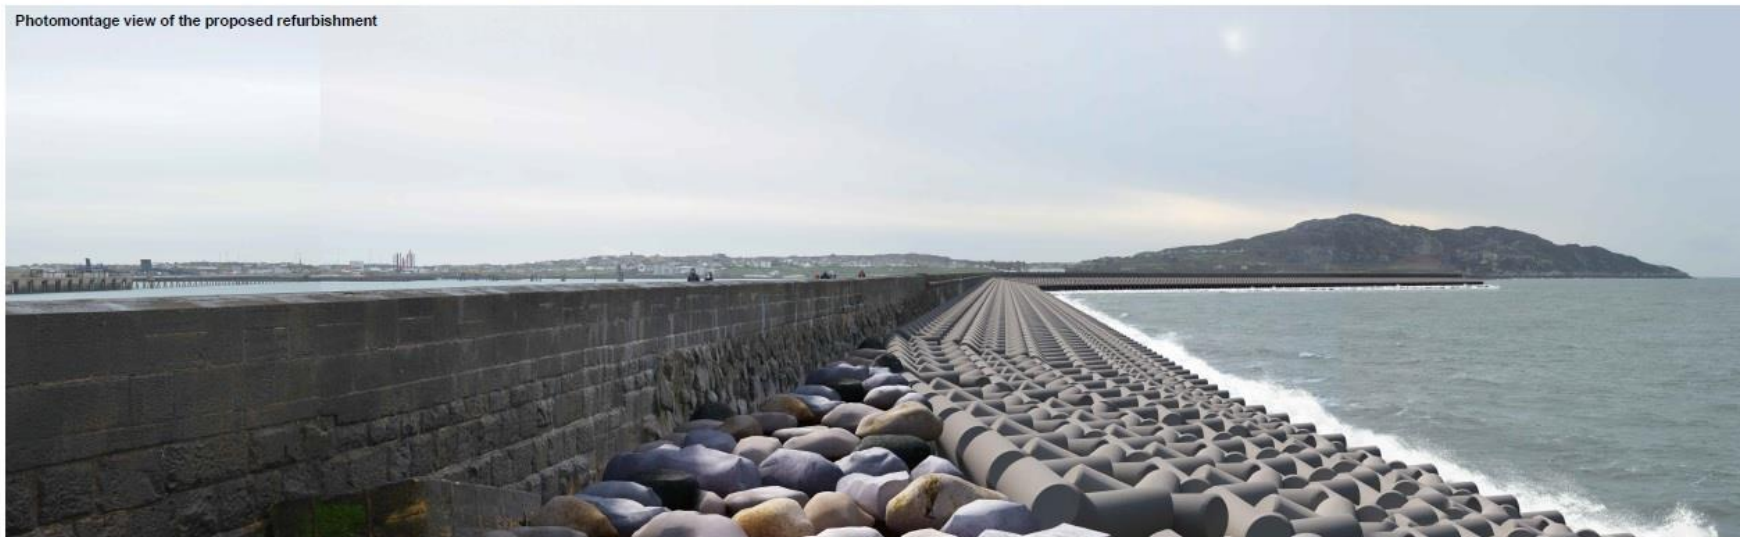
Viewpoint looking south west from the head of Holyhead Breakwater towards Holyhead Mountain
